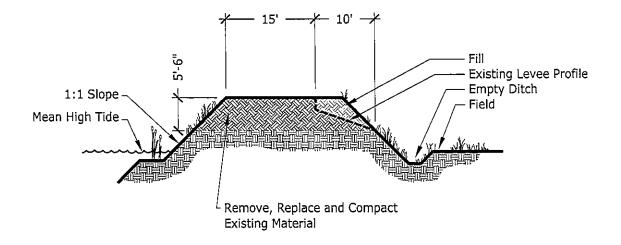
Typical Levee Repair Cross Section - West and North Levees
